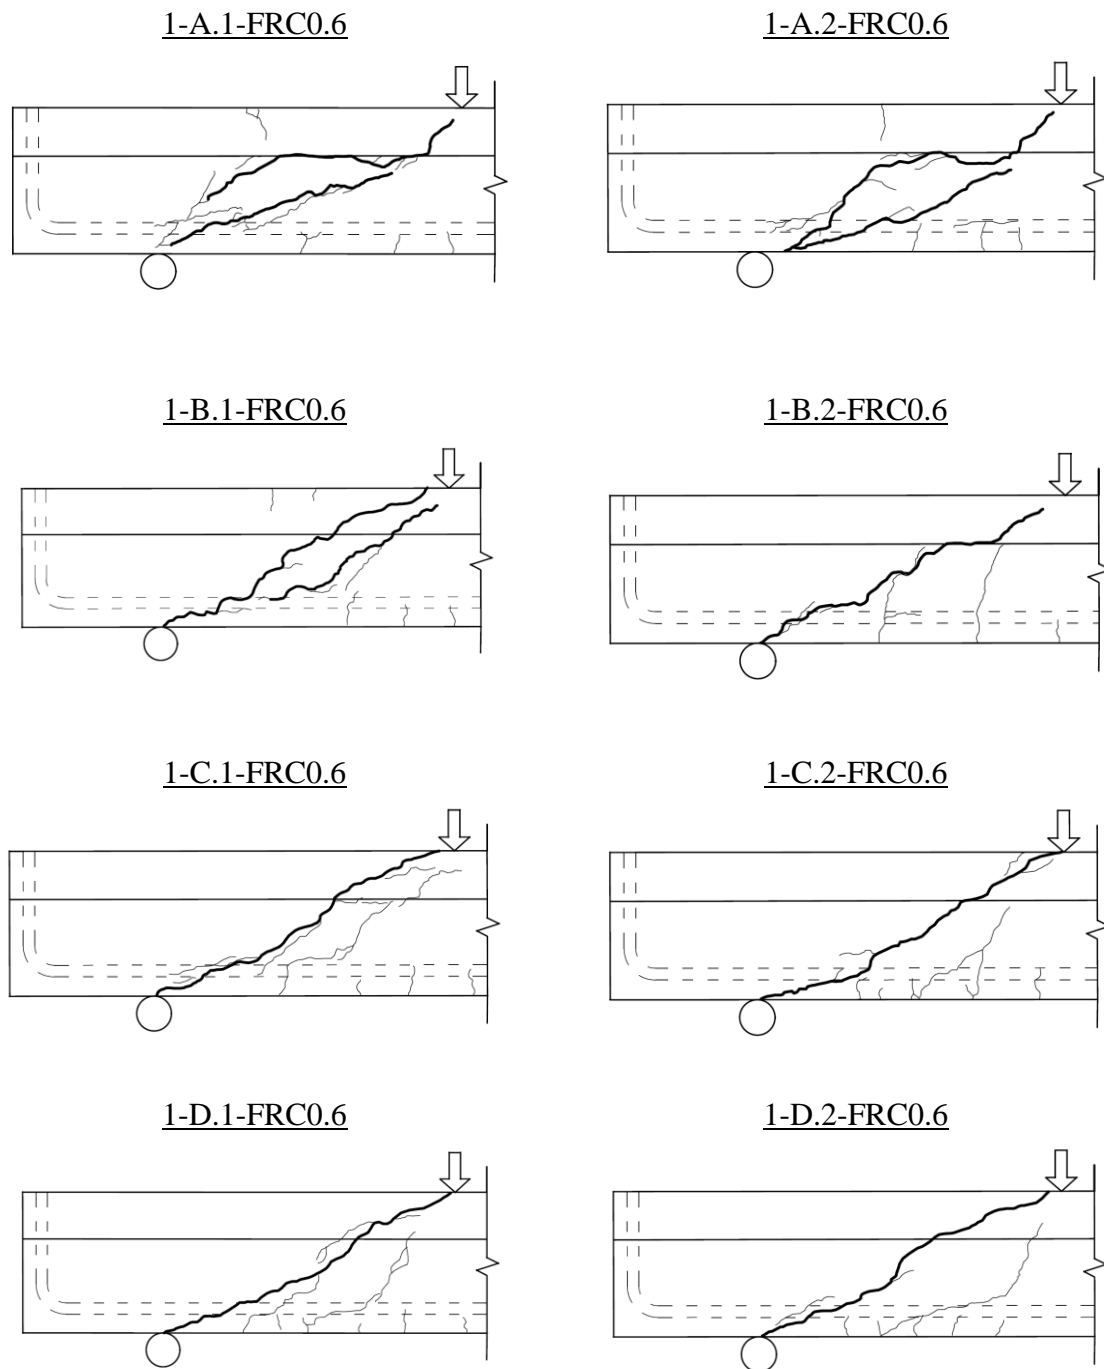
Final crack pattern of beams in Set 1 containing 0.6 % fibres.
